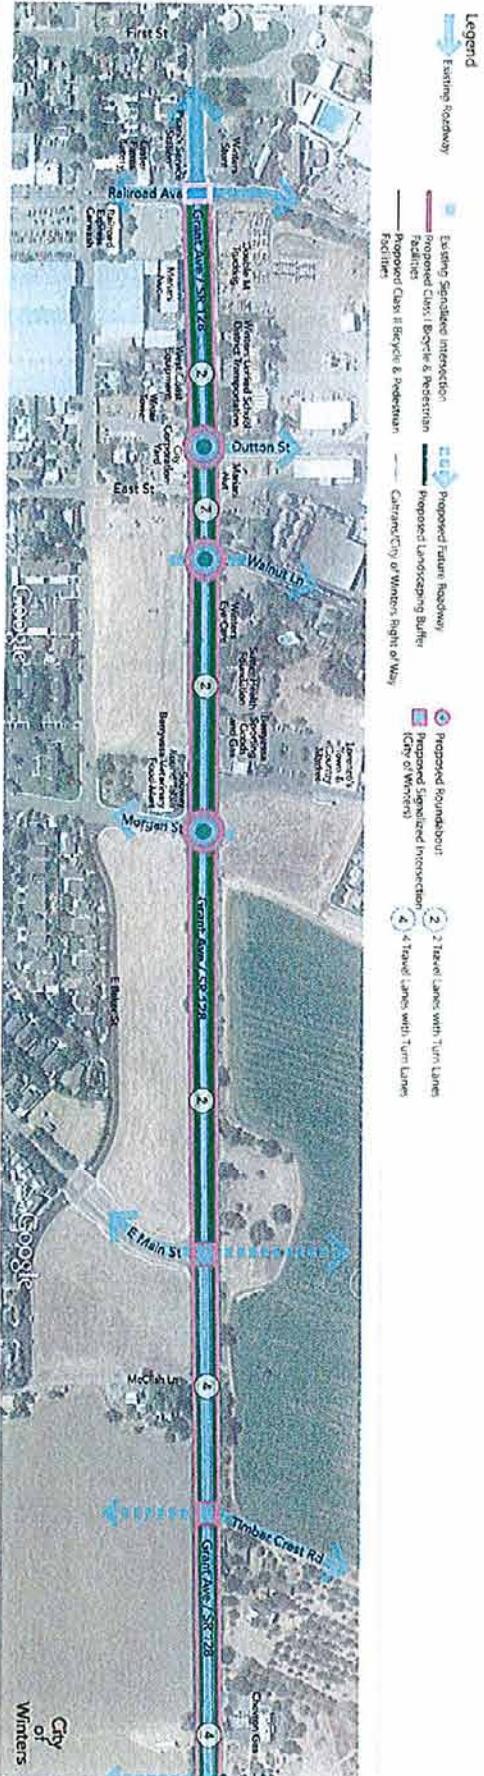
PLAN VIEW OF COMPLETE STREETS CONCEPT
